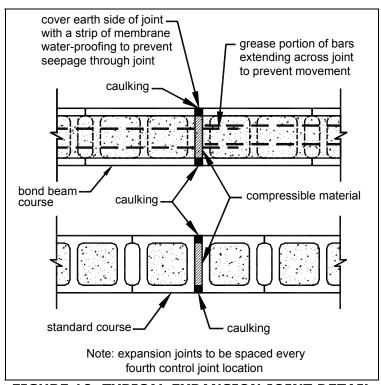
TYPICAL EXPANSION JOINT DETAIL
